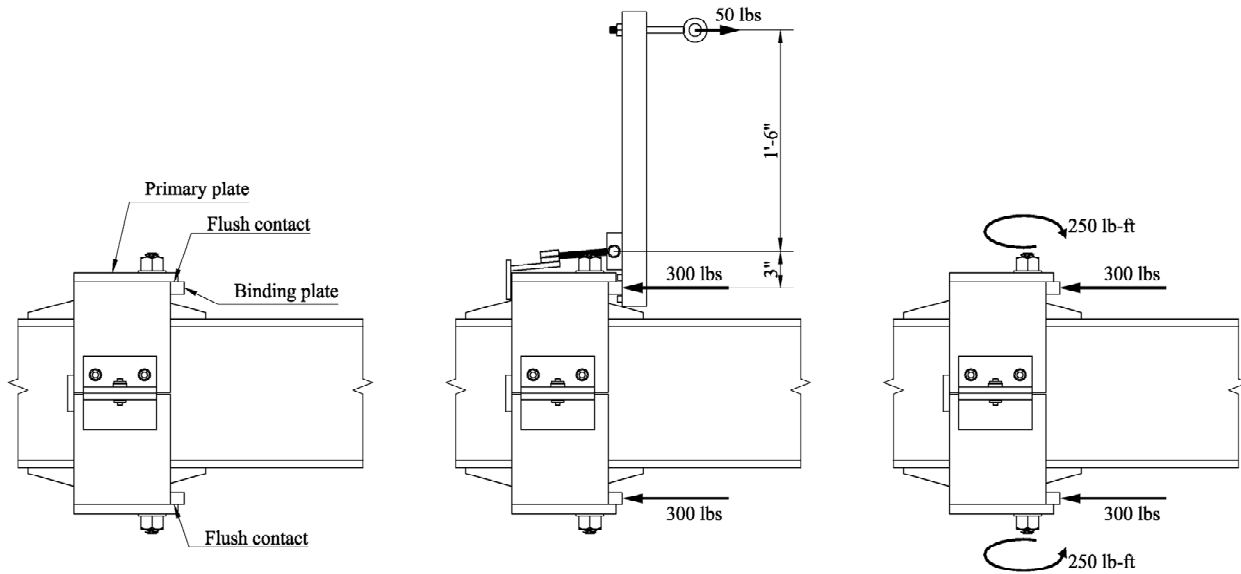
Installation of bolted connection between binding plates and primary plates
